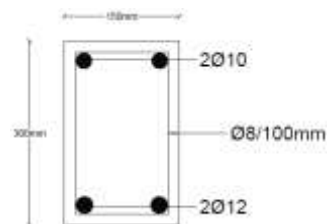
Transverse Profile of the loop stirrup beam (LSB).
